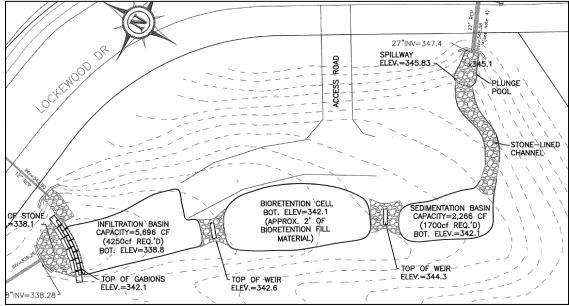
Excerpt from As-built Plan Prepared for the Lockewood Drive Stormwater Retrofit.
